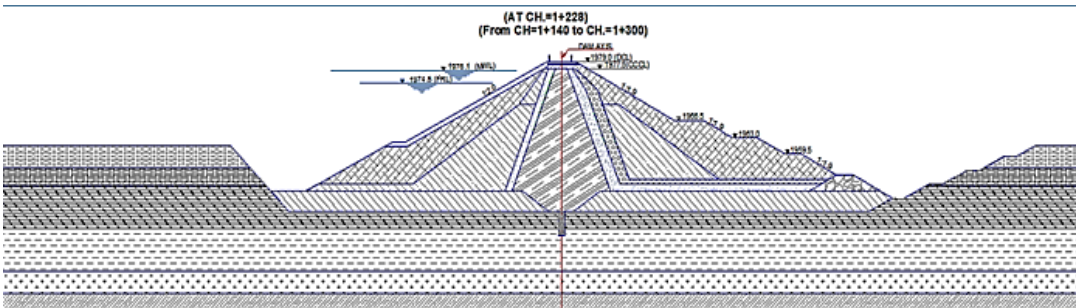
45 Final Drawing for Measurement for pricing for BH-4
